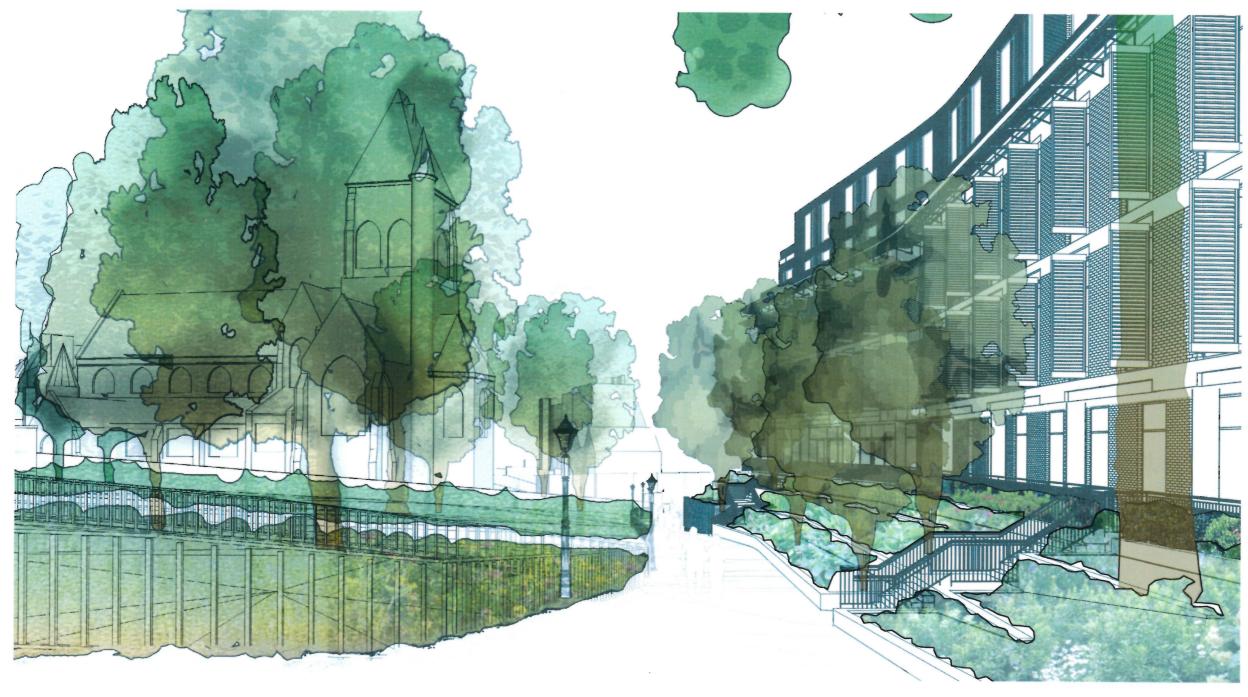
Extract of Section 5.8 of the originally submitted Design and Access Statement - Elevations and Materials
